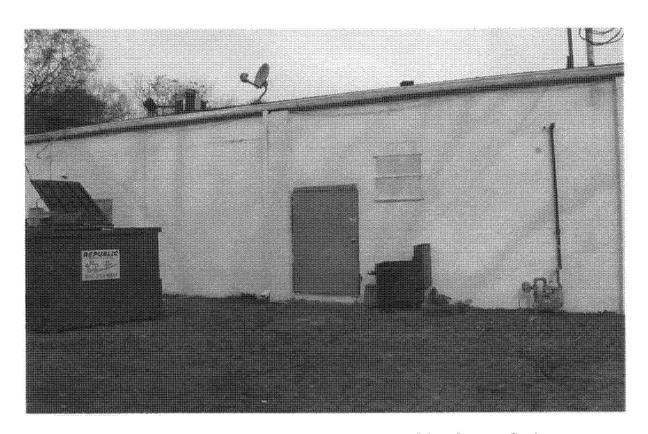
Backside of 3819 W. Michigan Street (dumpster, old cooker, gas line)
